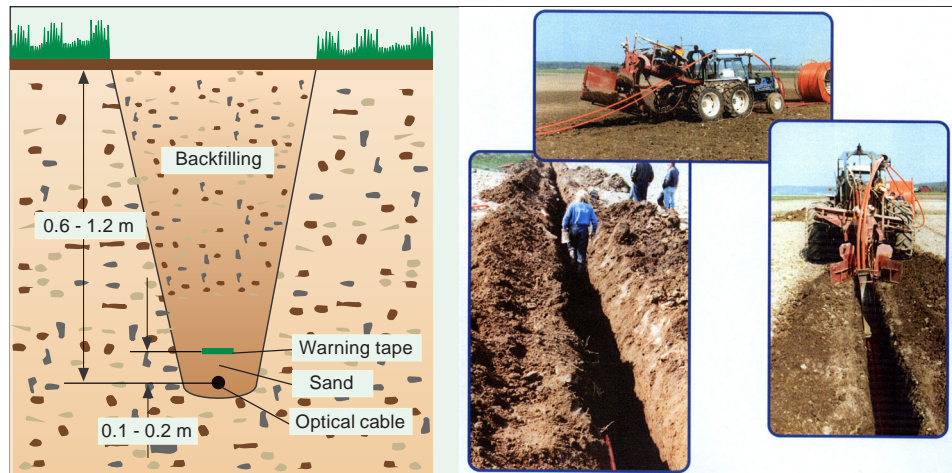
Laying of optical fiber cable with a specially equipped excavating tractor.
